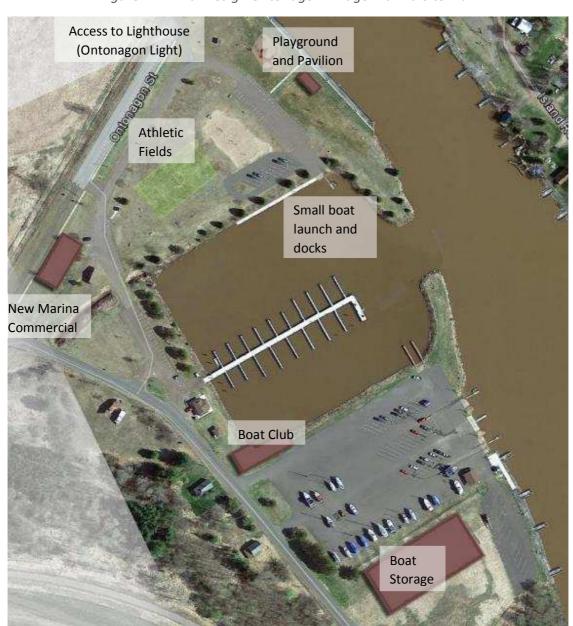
Final Design Ontonagon Village Marina Site Plan
